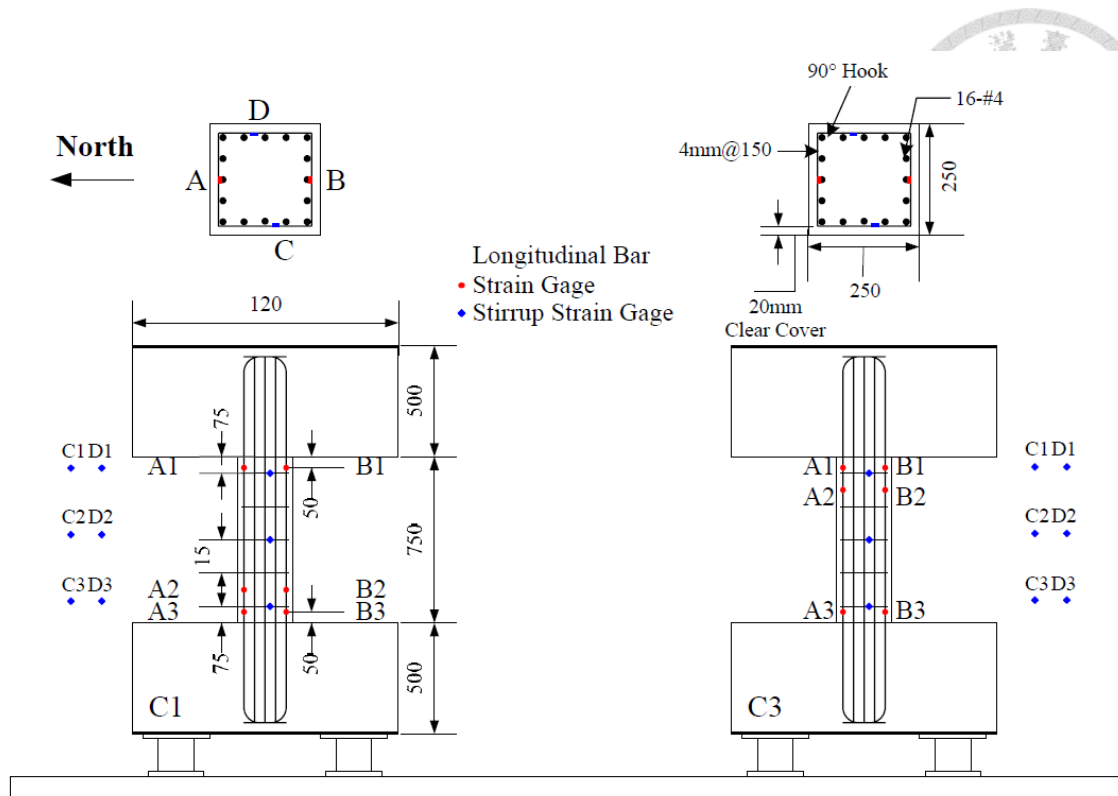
Shaking table test T3 specimen design layout (Su 2007)
